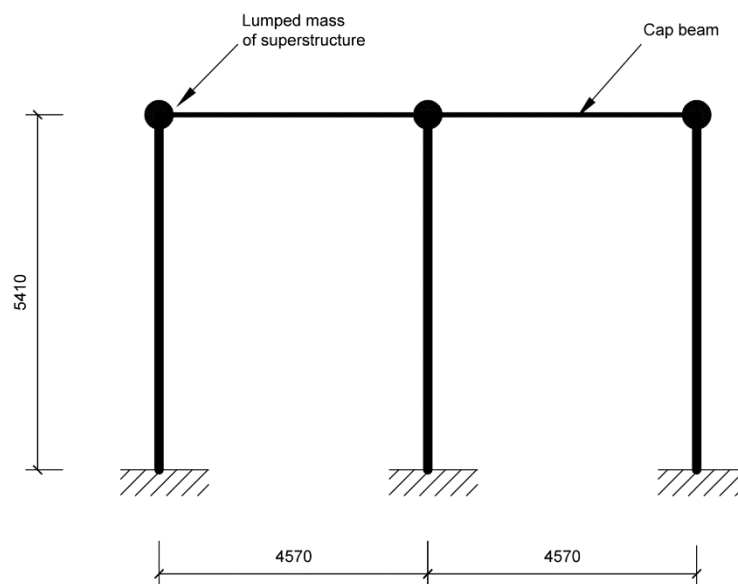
Finite element model of Bridge #8 in the transverse direction.
